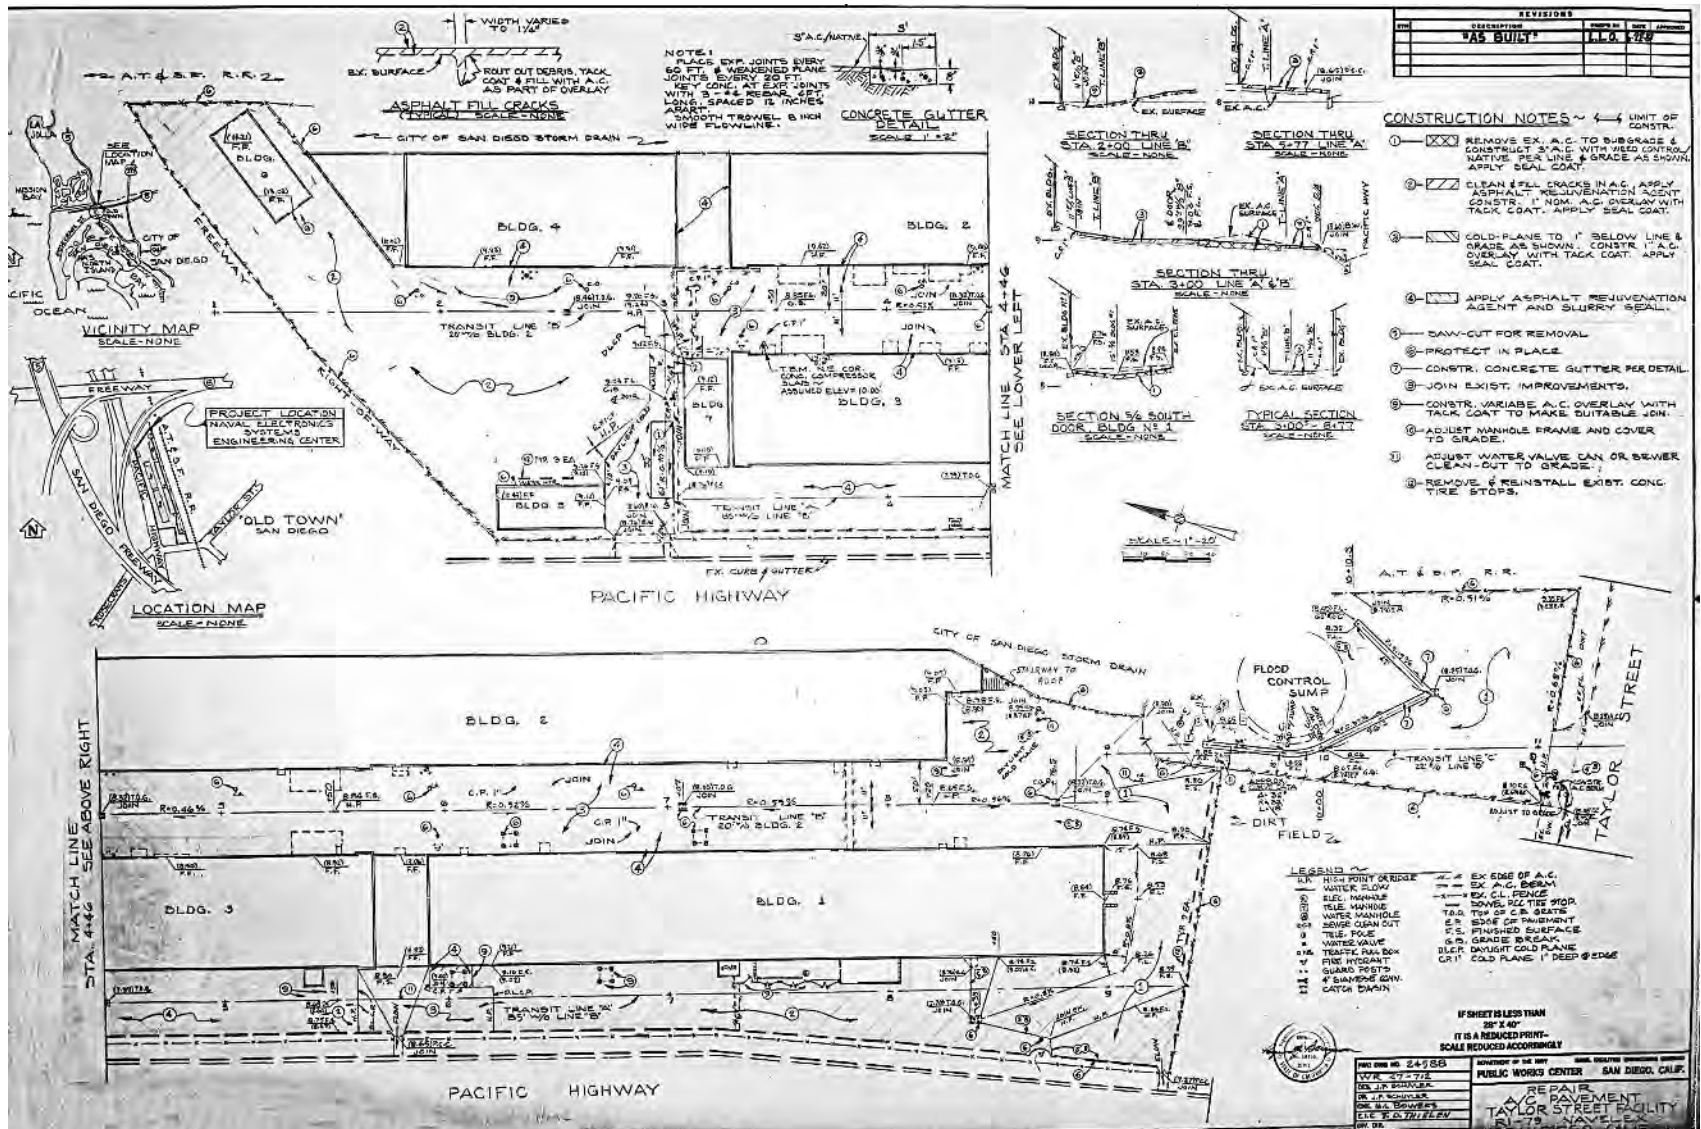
Taylor Street Complex, Pavement Repair Drawing, 1979
